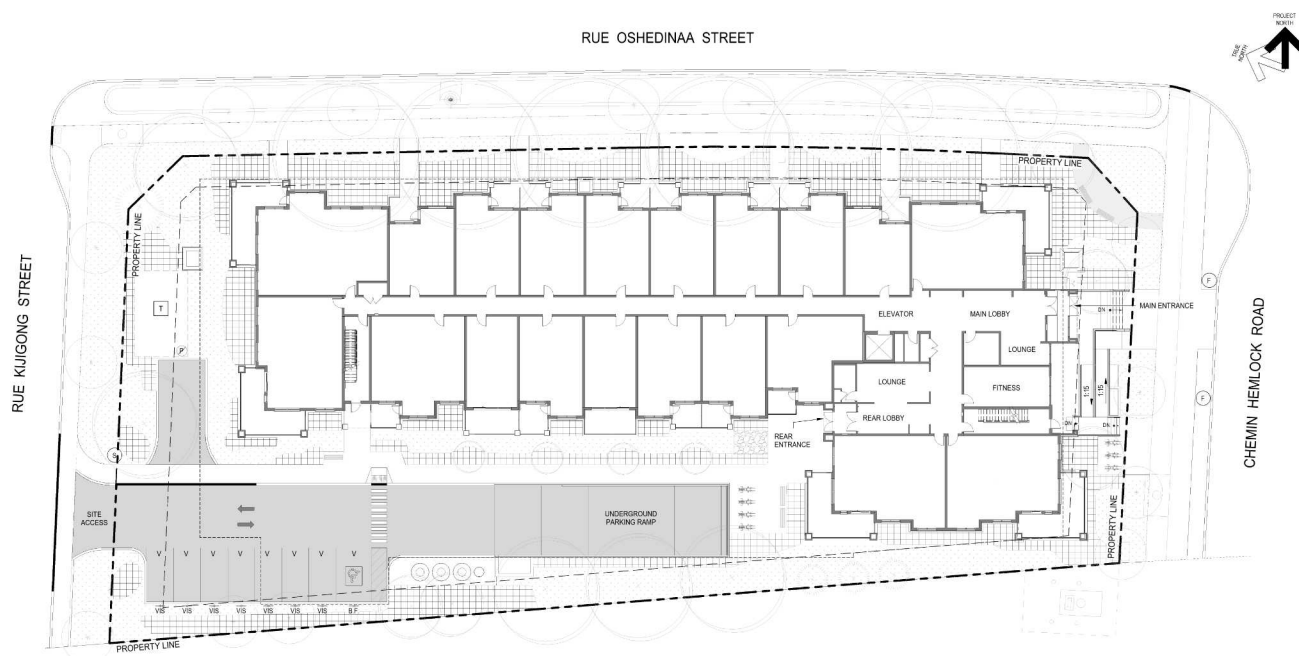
Ground floor plan demonstrating relationship of units and common areas to public realm (August 2024).
